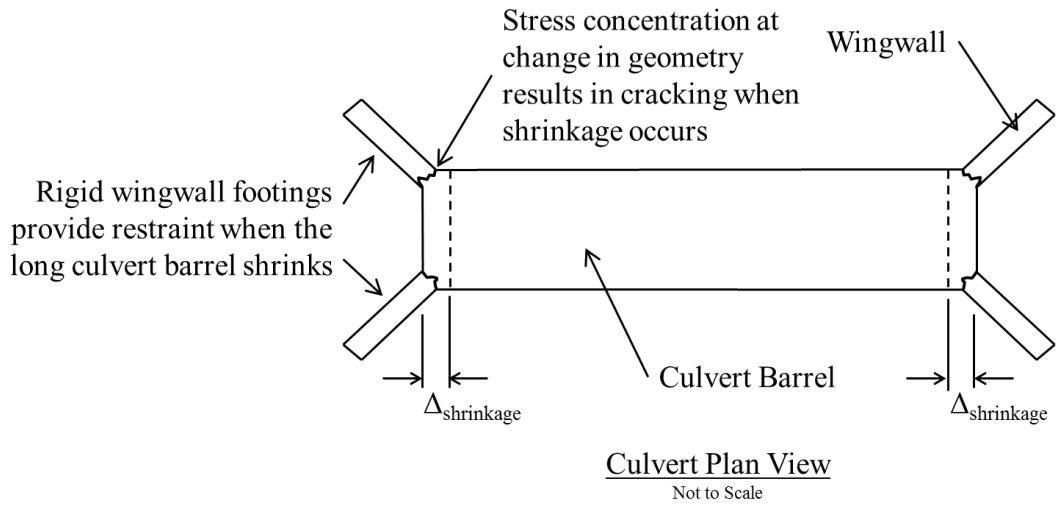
Cracking at the Wingwall and Culvert Intersection Illustration
